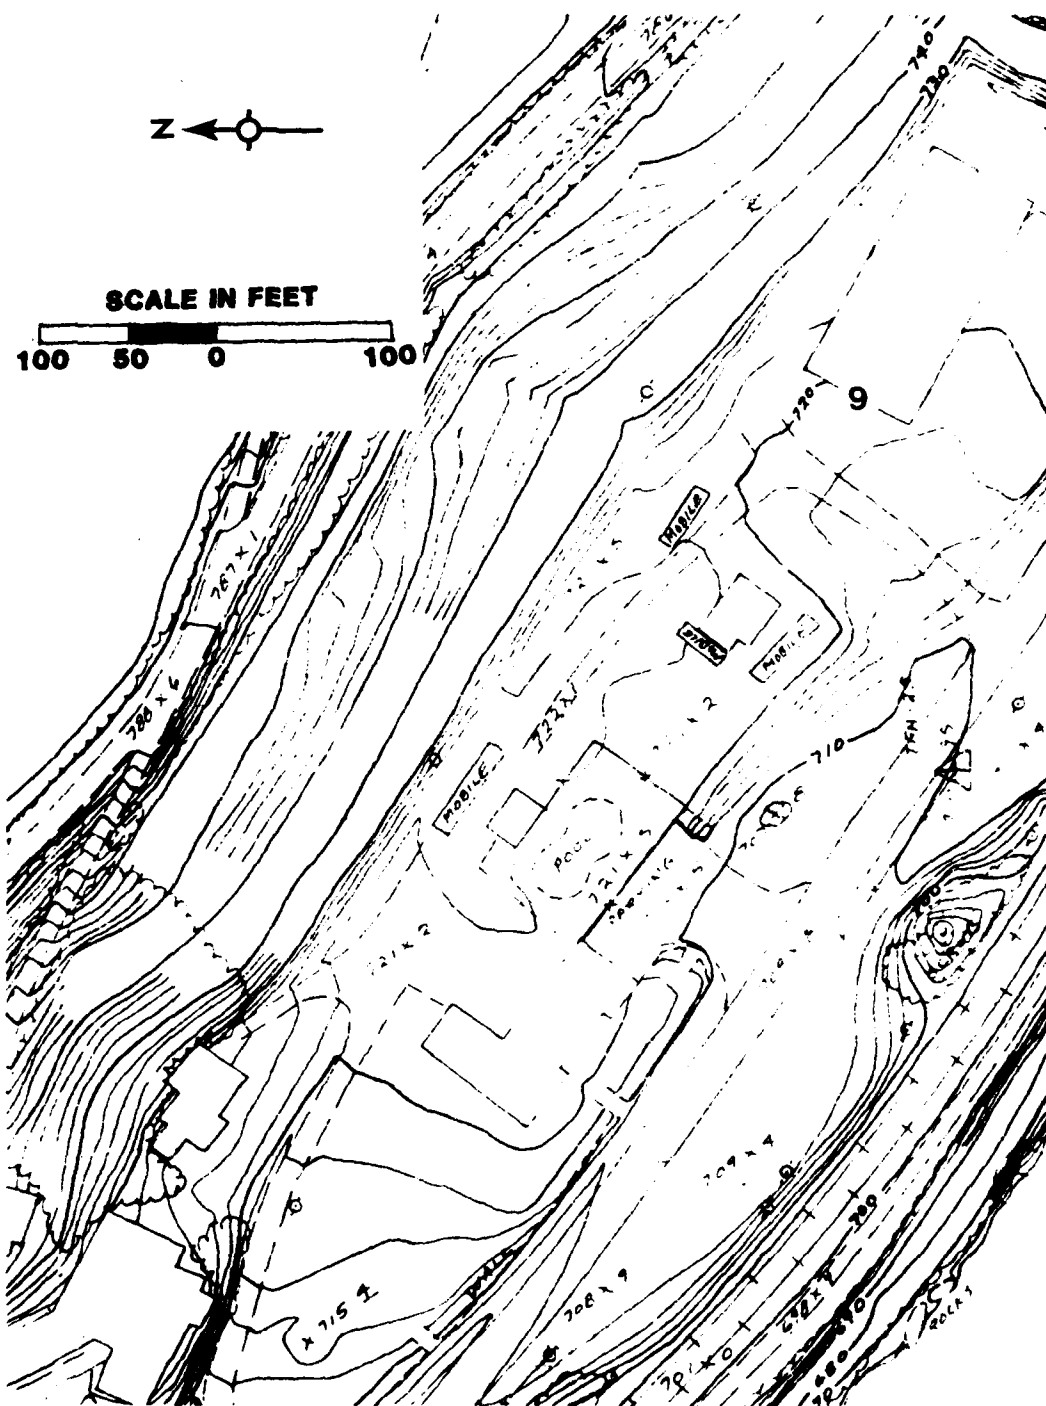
Traffic induced vibration Monitoring Station 9; foundation, 3rd, 6th and 9th floor balconies, Smith Towers.
